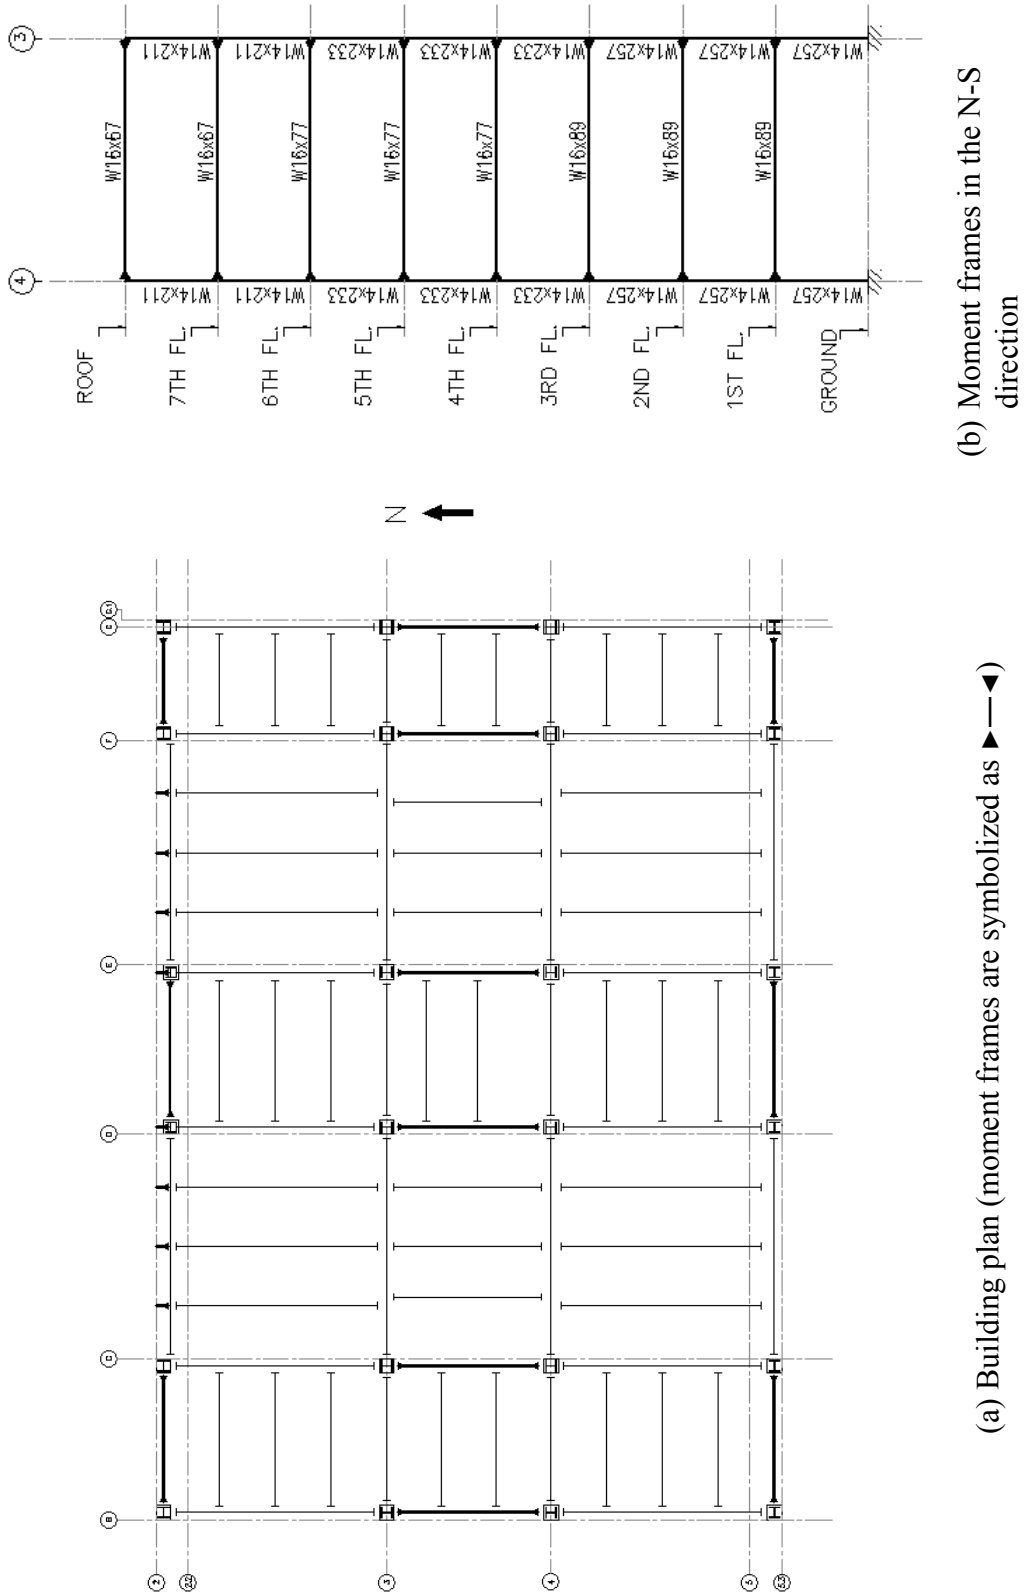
Plan view of the eight-story building and elevation view of the N-S moment frame
